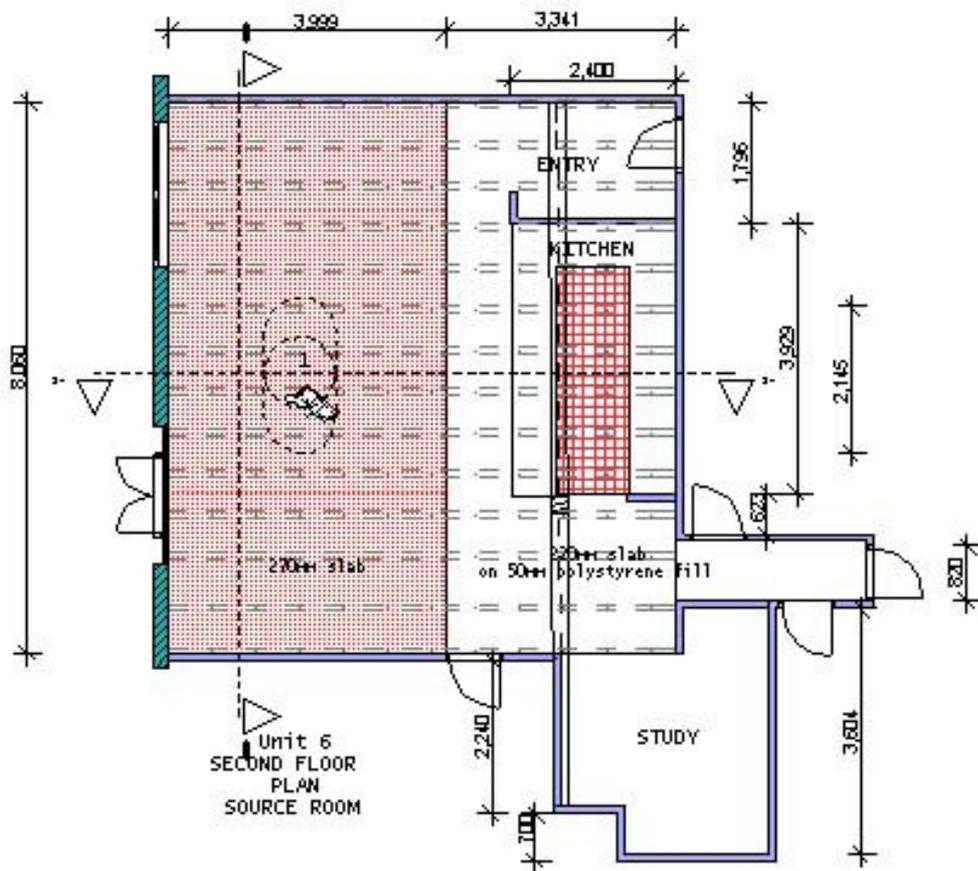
FLOOR PLAN SOURCE ROOM (not to scale)
